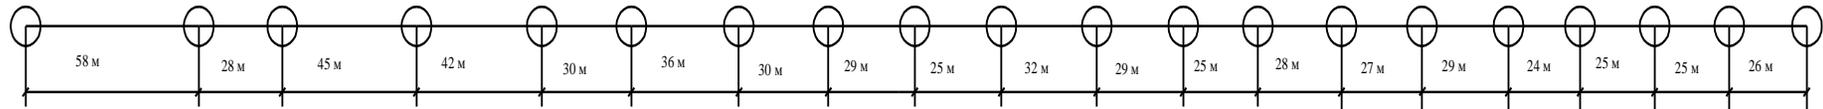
Schematic layout of lighting towers in Ul. Sovetskaya (before the intersection with Ul. Pionerskaya), City of Novogrudok (layout – one-sided, luminaire installation altitude – 8.5 m)
